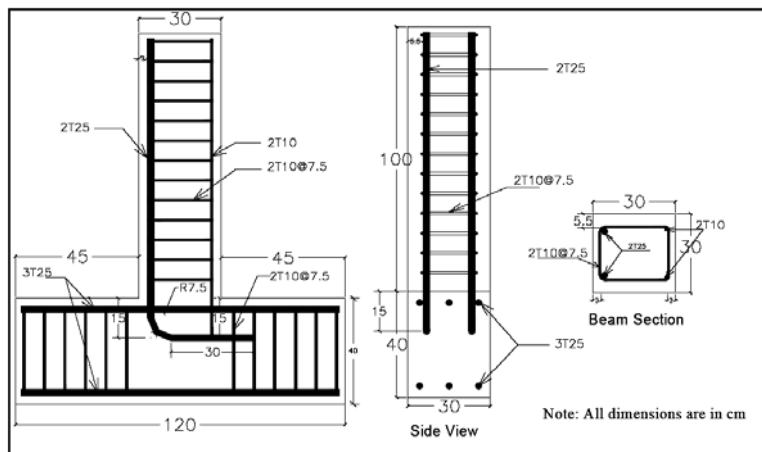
Details of the beam-column specimen C25H; confined anchorage mode, 25-mm beam bars.
